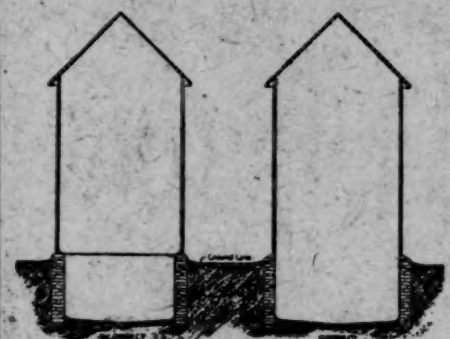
Correct and incorrect methods of constructing silo foundations.
